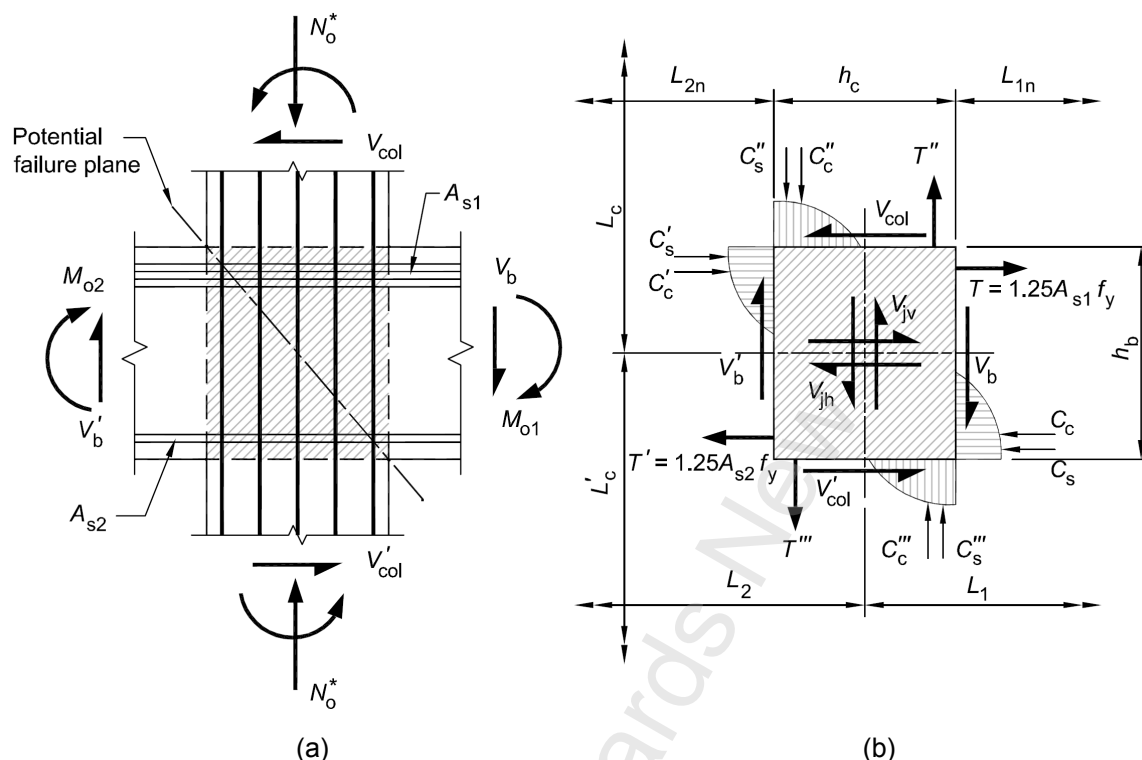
External actions and internal forces of a typical interior beam-column joint
